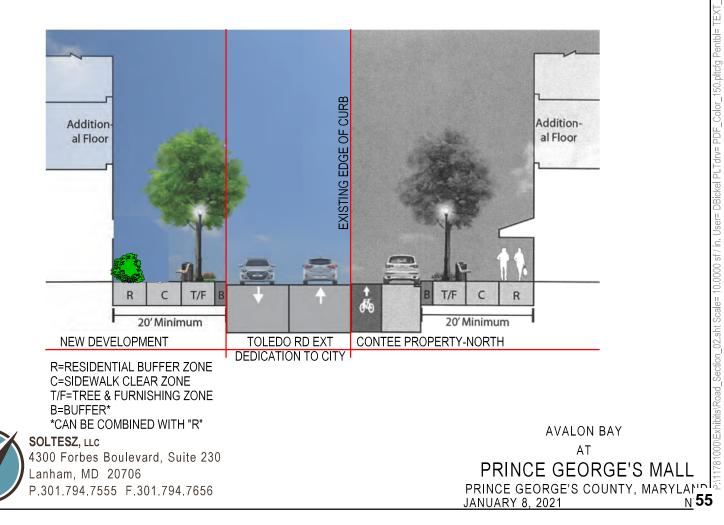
TOLEDO ROAD EXTENDED STREET SECTION
